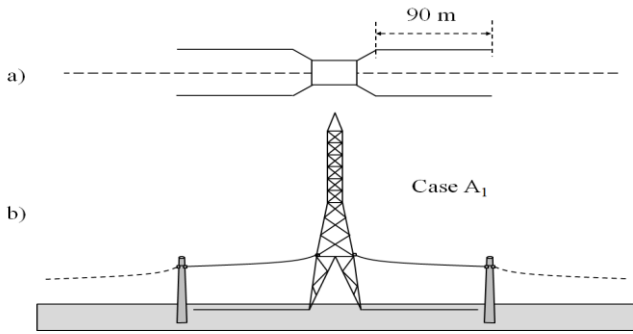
Continuous aerial wire connecting adjacent towers, Case A<sub>1</sub>, a) top view and b) side view.
